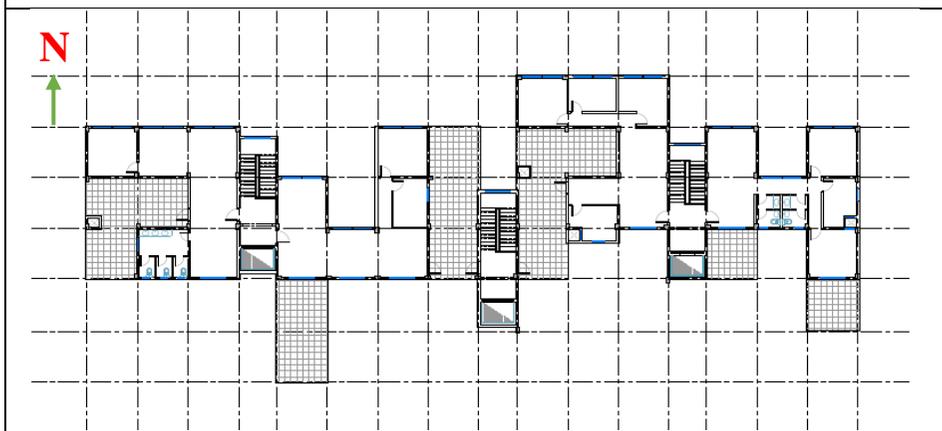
Office building proposed fourth floor plan, Source: Author
